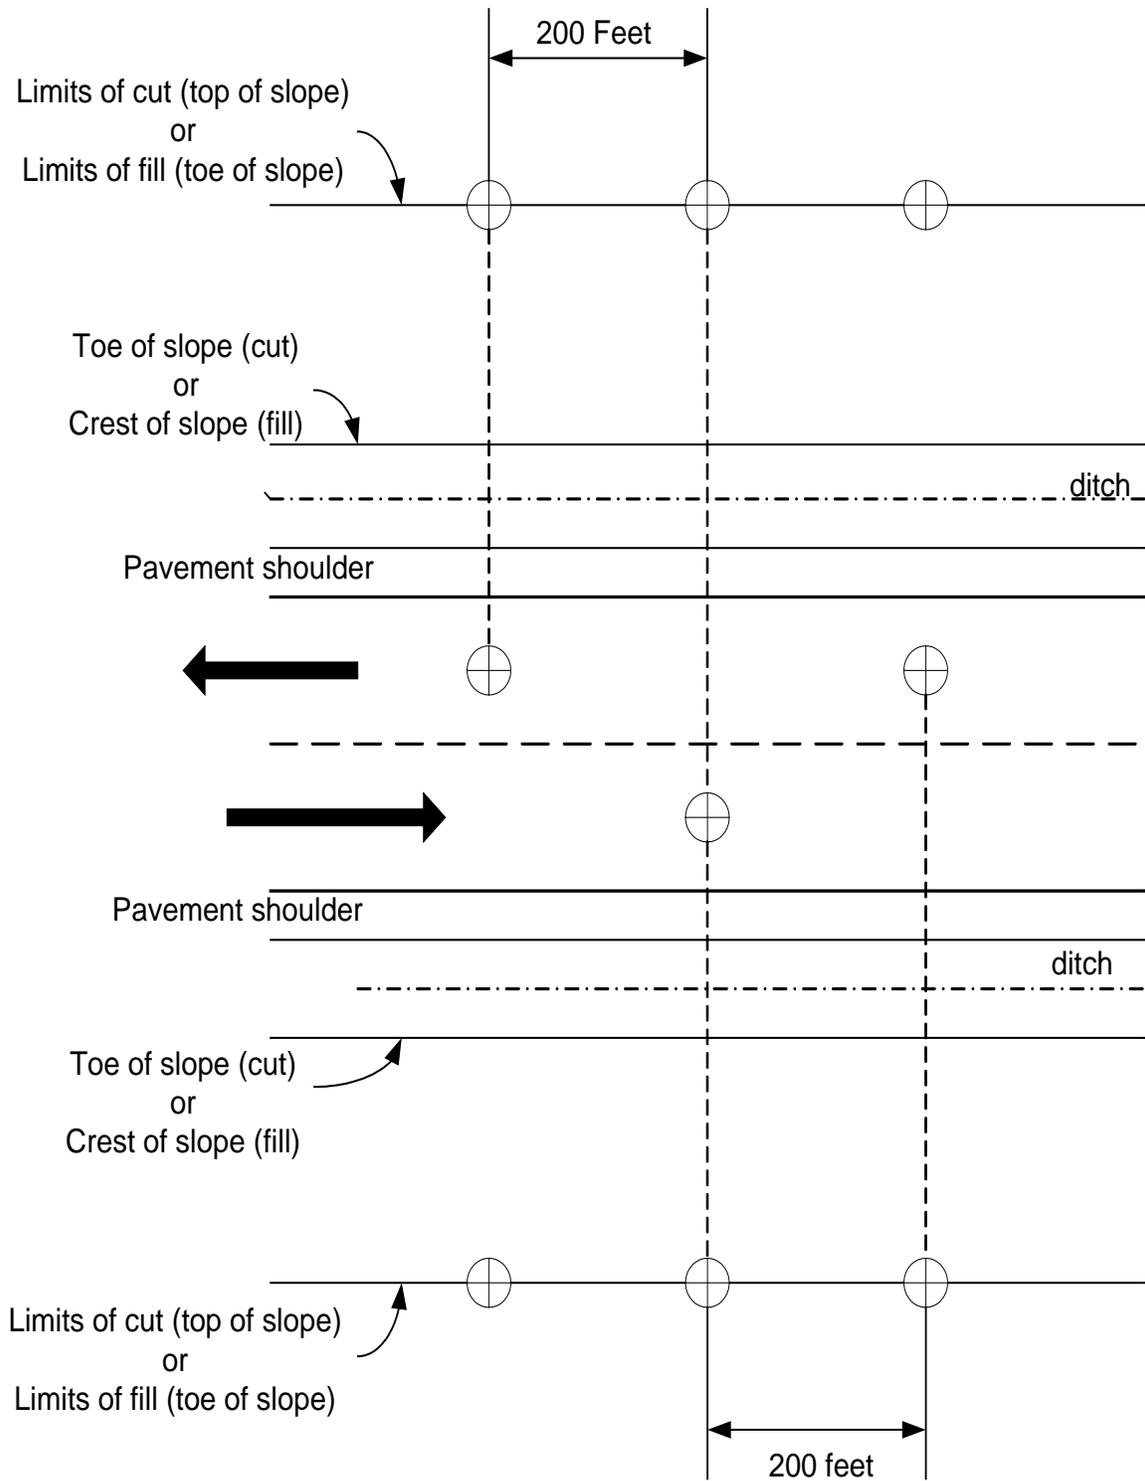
EXPLORATION LAYOUT FOR A TWO LANE ROAD WITH CUT OR FILL SLOPES EQUAL TO OR GREATER THAN 25 FT HIGH OR AREA WHERE ROCK IS EXPECTED TO BE ENCOUNTERED ABOVE THE PLANNED DEPTHS OF EXCAVATION
